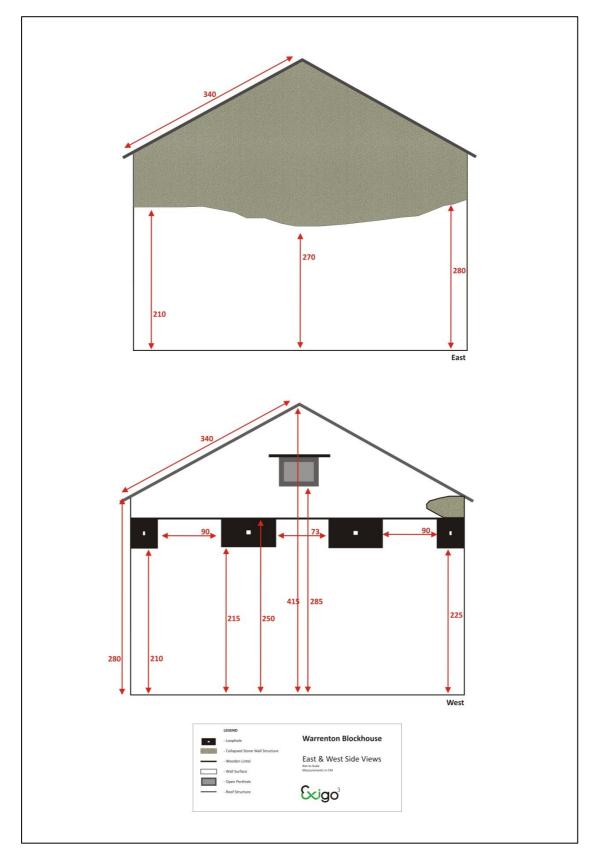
Plan of east and west views of the Warrenton blockhouse structure.
